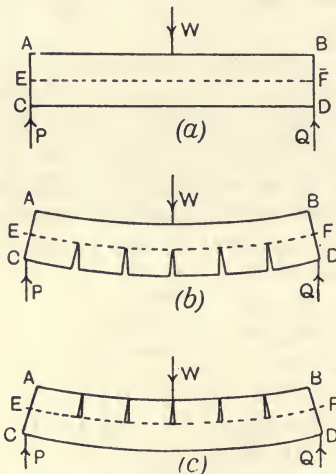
Longitudinal tension and compression in a loaded beam.
